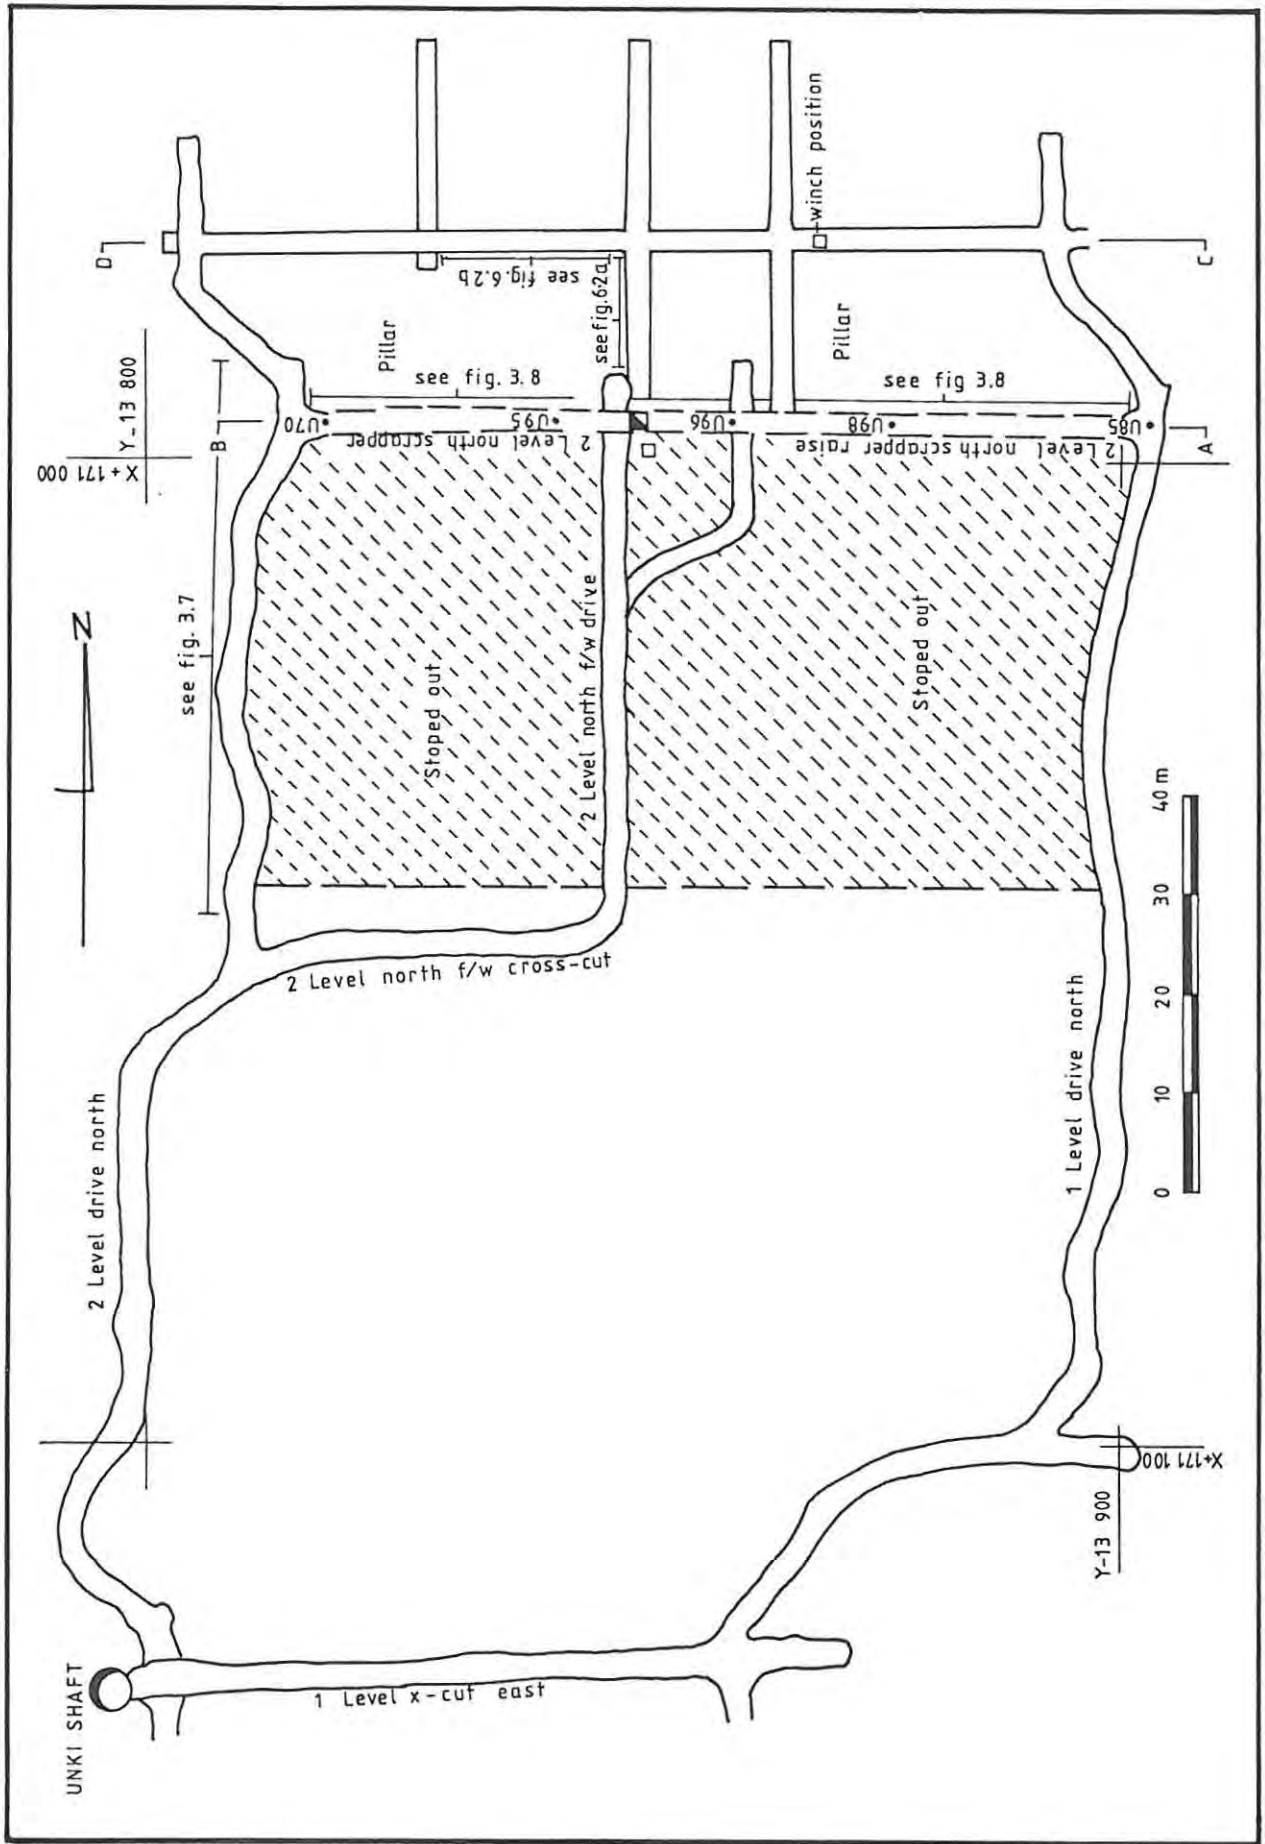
Unki Mine Level Plan, trial stoping 1994/5
